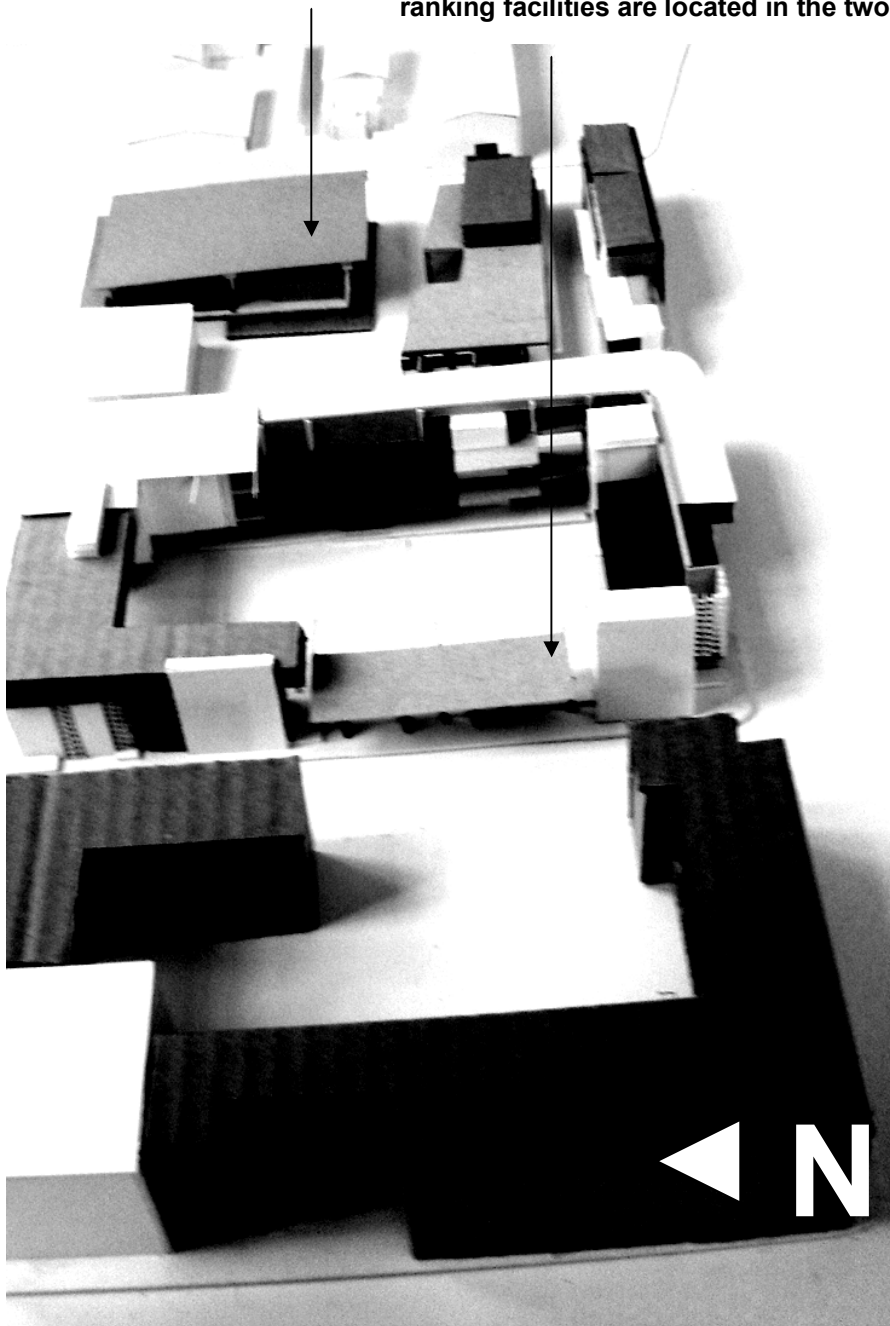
site layout with the bathhouse and community hall situated to the east of Jerusalem Street, ranking facilities are located in the two blocks bordering Fourth Street.
